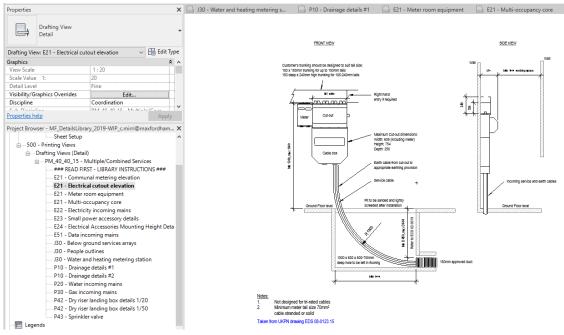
EXAMPLE ELECTRICAL CUT-OUT ELEVATION
